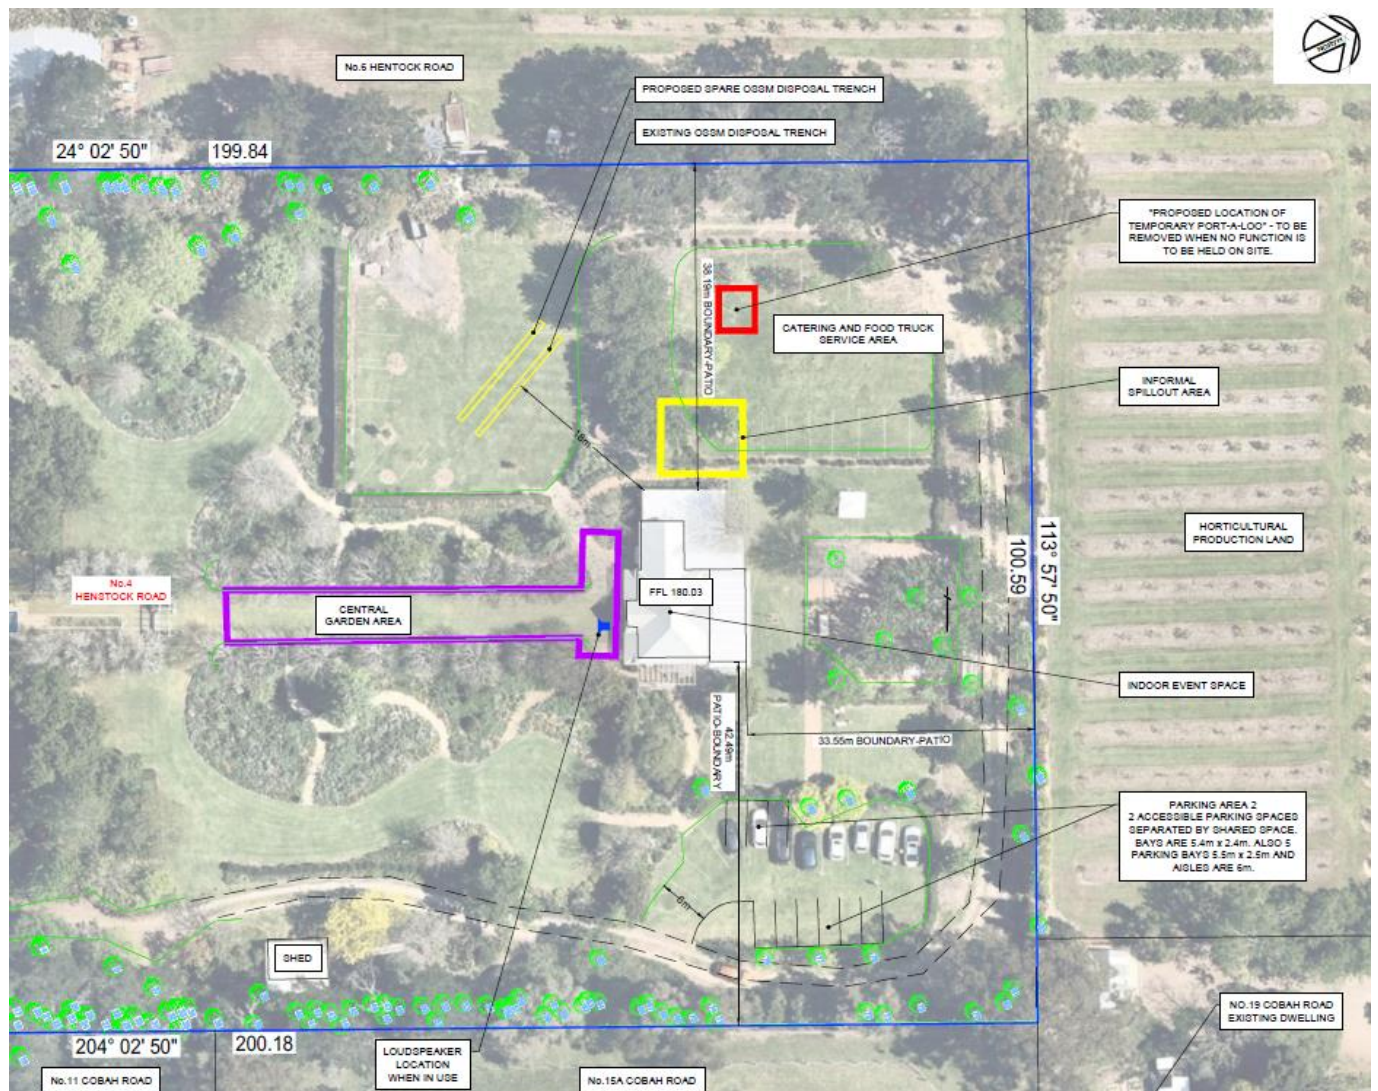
Site Plan indicating proposed use (Source: BRS, 2023)
